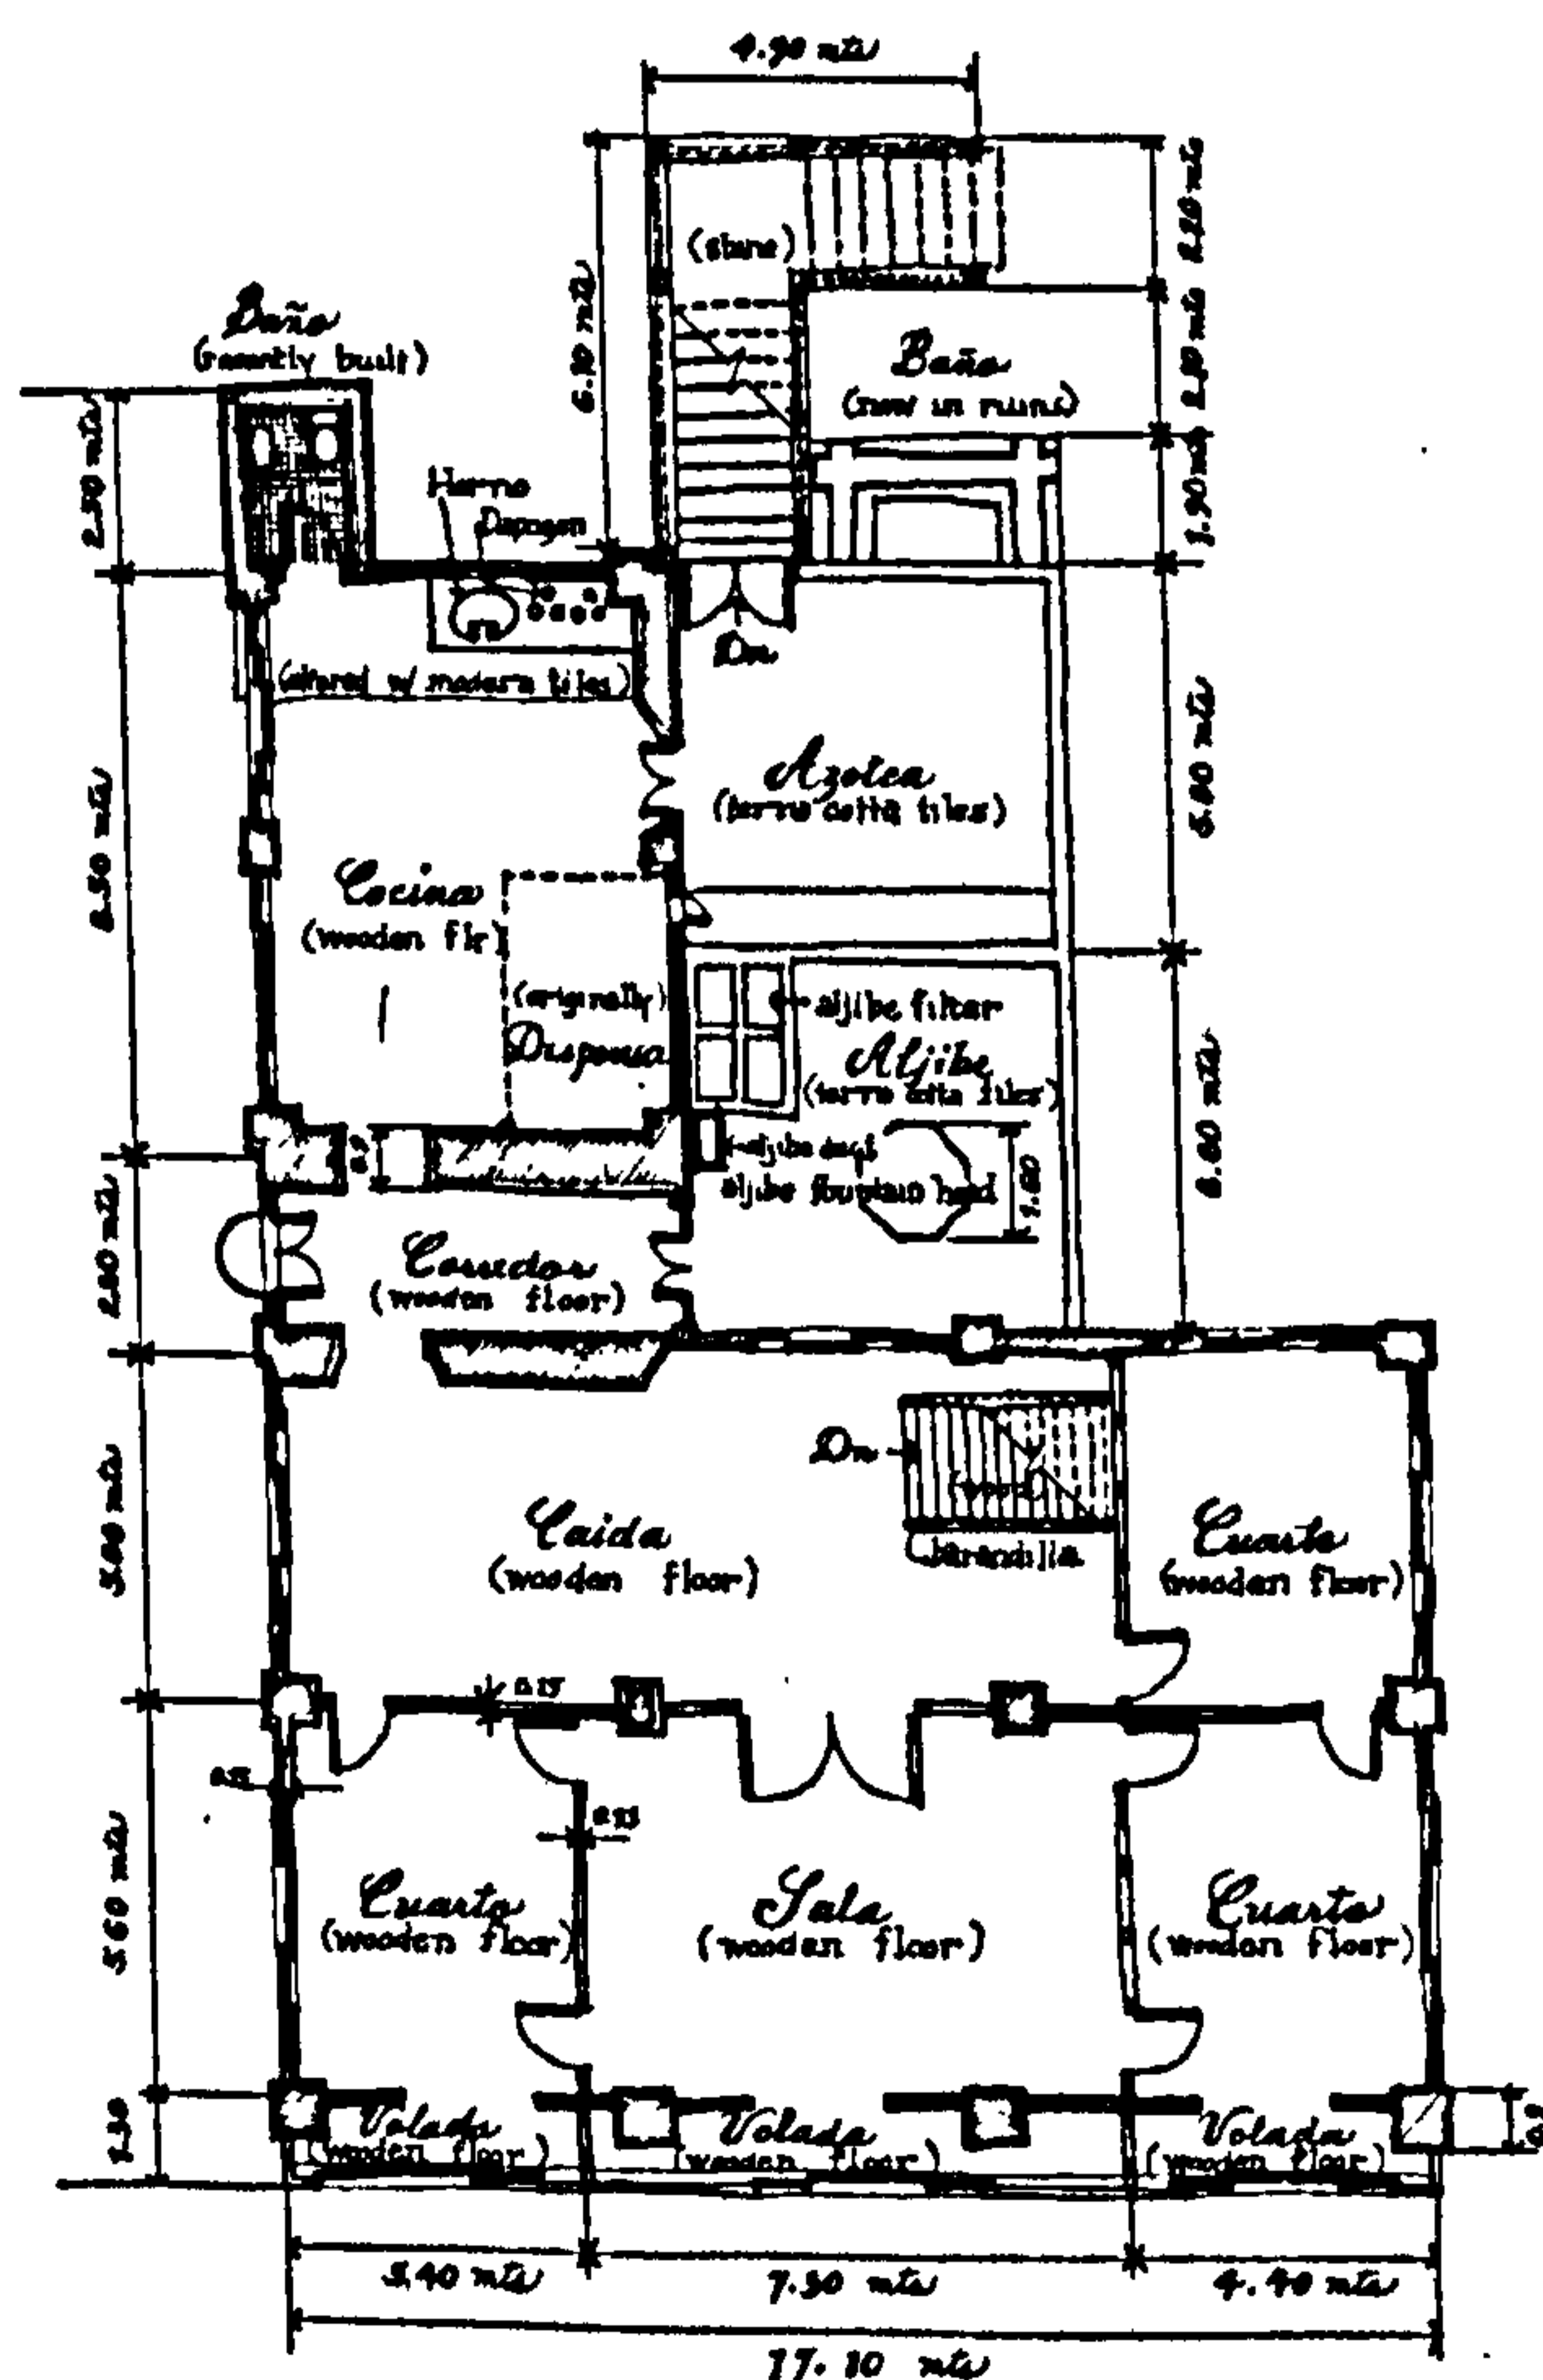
Typical first floor plan of ancestral houses. (Sources : Zialcita, 1980:121)
